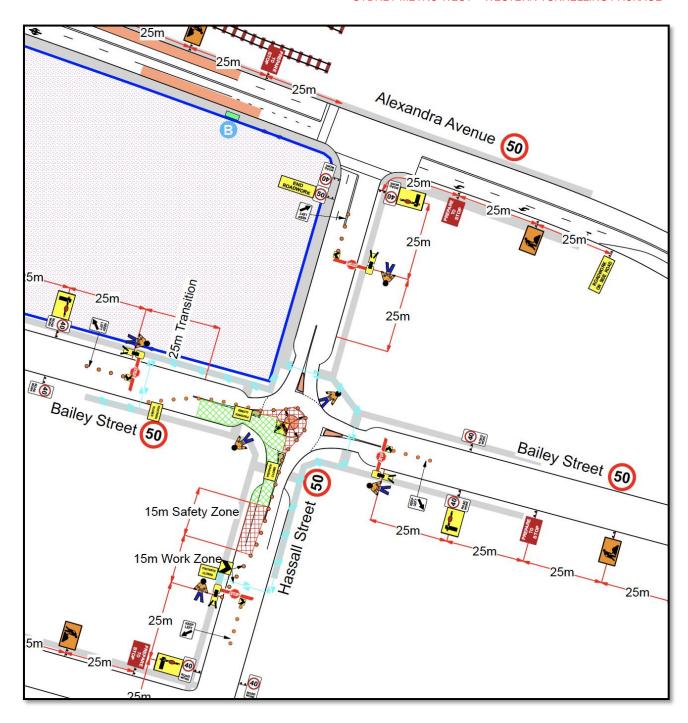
TGS Hassall St and Bailey St south western corner stop slow (refer to Appendix B for full TGS)
